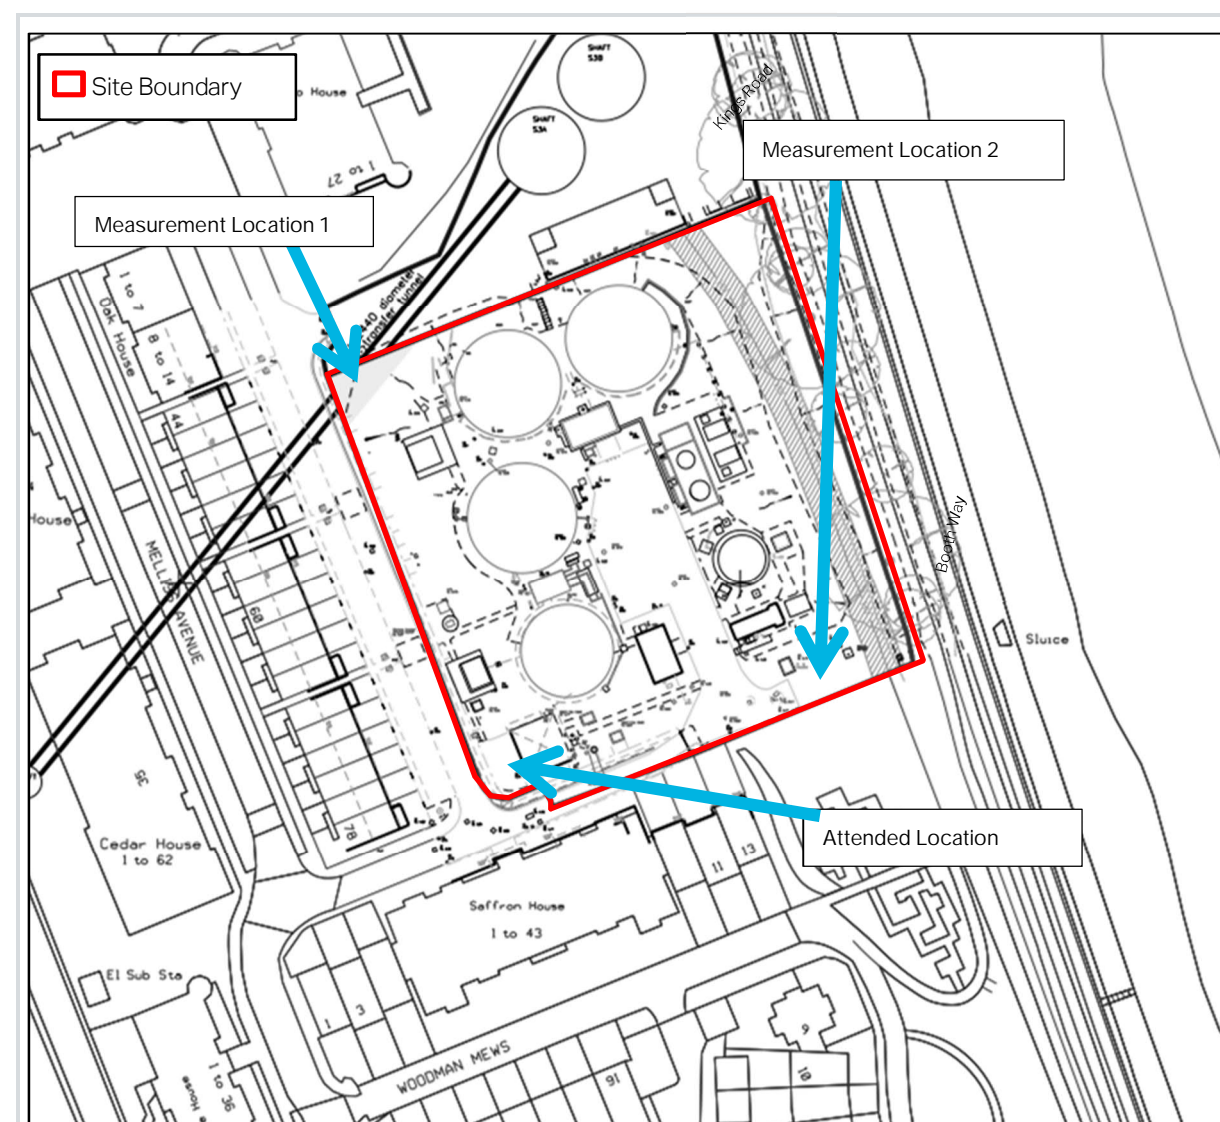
Melliss Avenue Site and Surrounding Area Showing Measurement Locations
